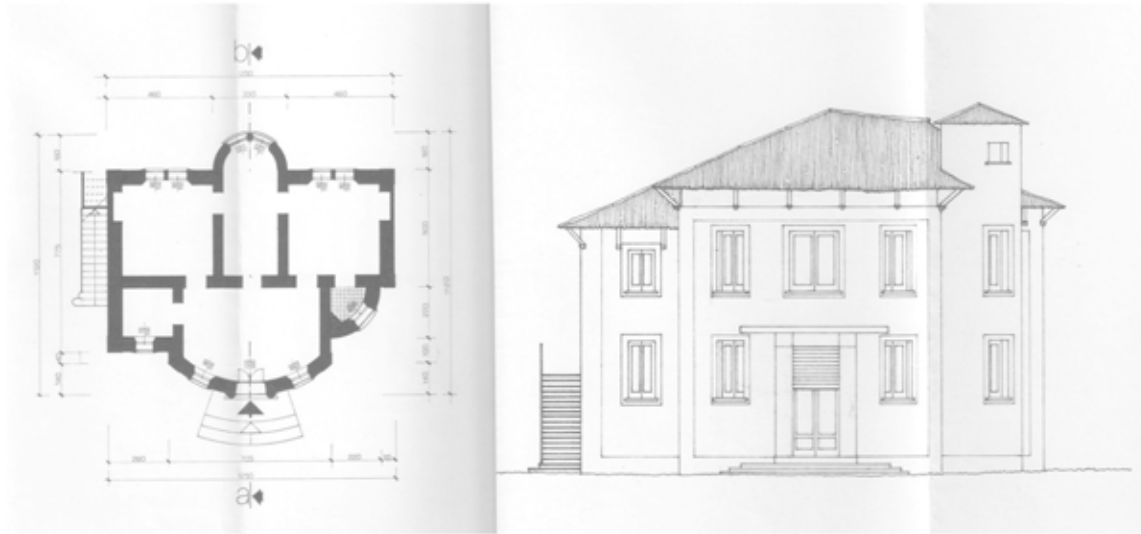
The medical clinic, ground floor plan and main façade (survey by Studio Eng. G. Scarnati)
